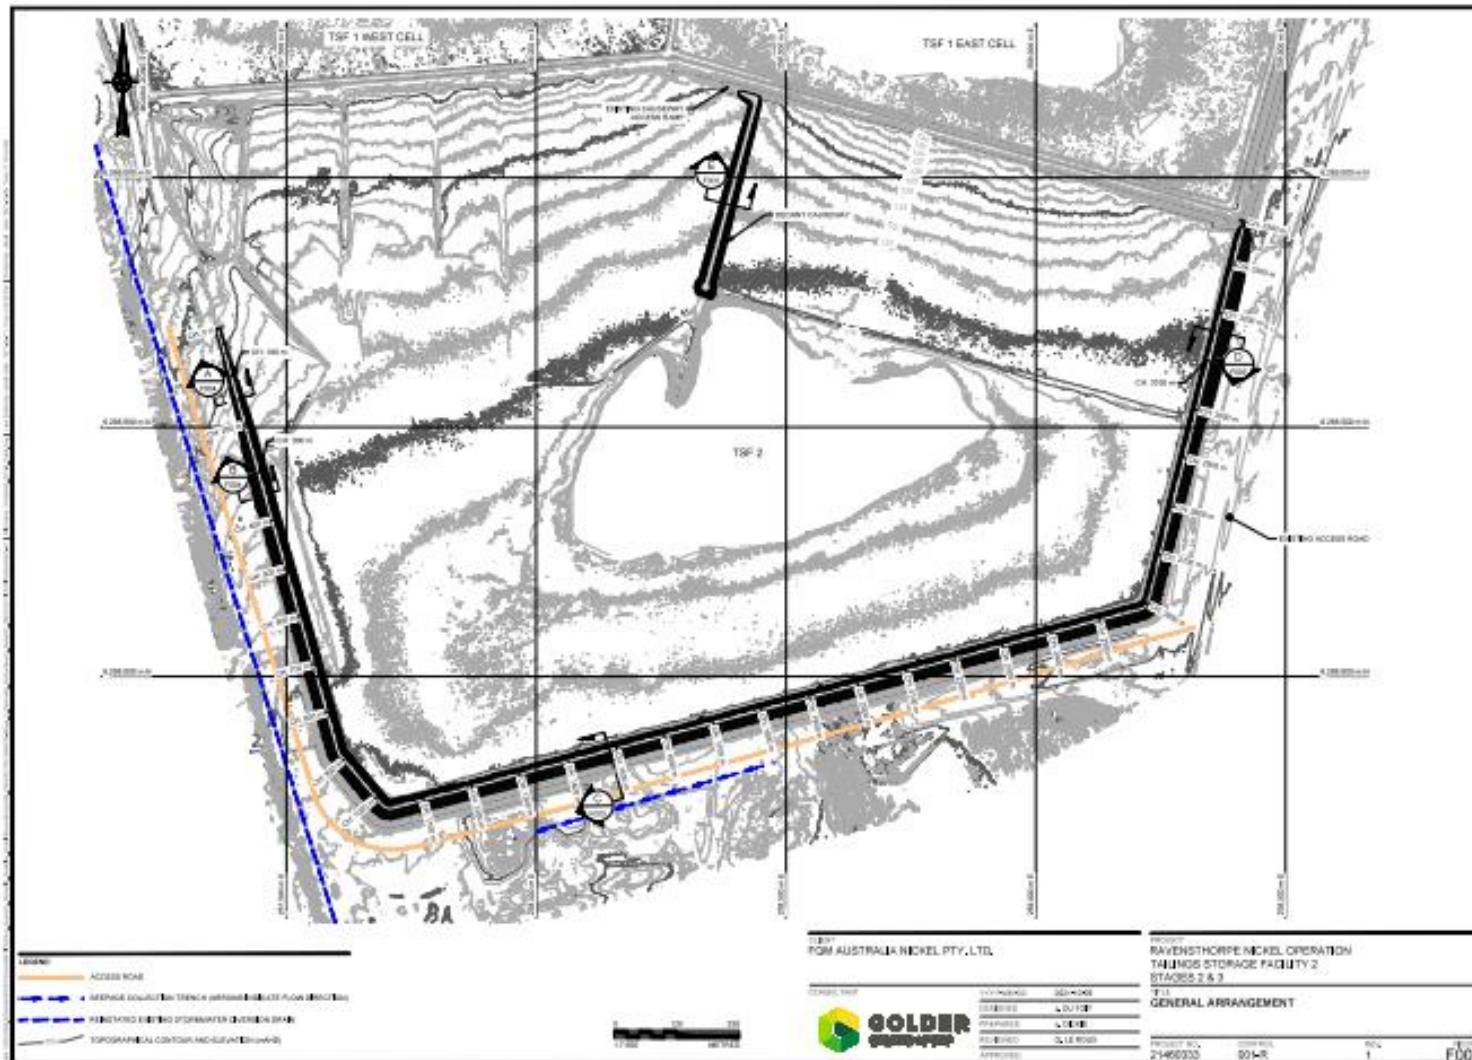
Stormwater and Seepage Management Infrastructure Plan
